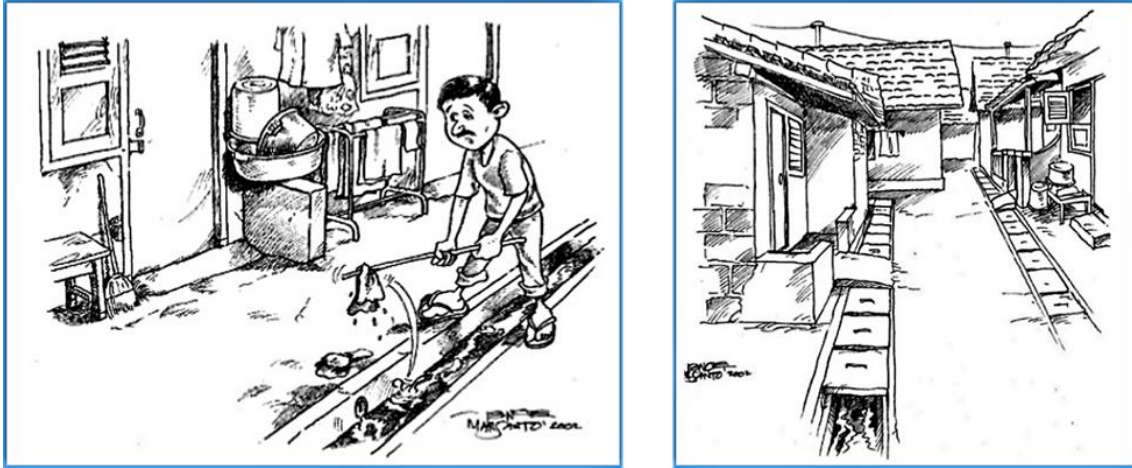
Open channel drainage system (Source: SANIMAS 2005)
